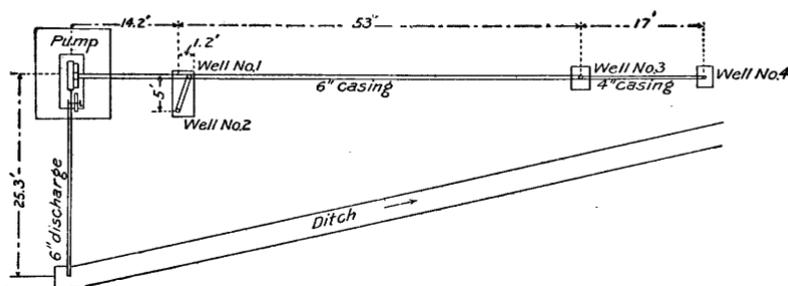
Plan showing arrangement of wells at Hadlock's pumping plant.
